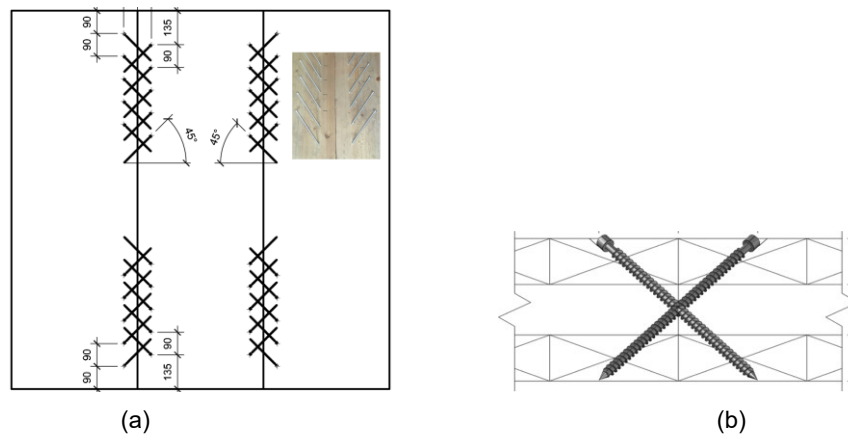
Edge connected shear wall: (a) arrangement of screw; (b) cross-sectional view [2]
